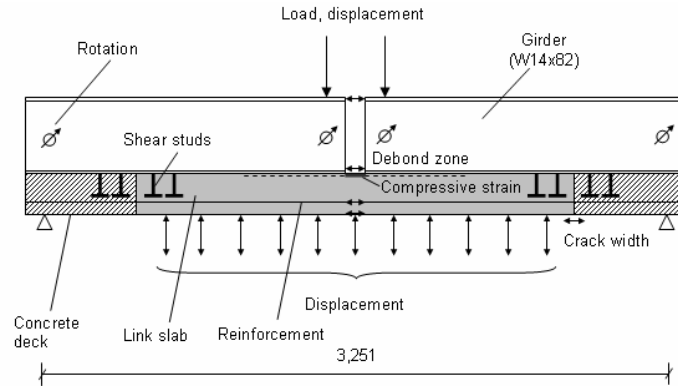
Laboratory test setup and instrumentation of specimen. (Dimensions are in mm)
